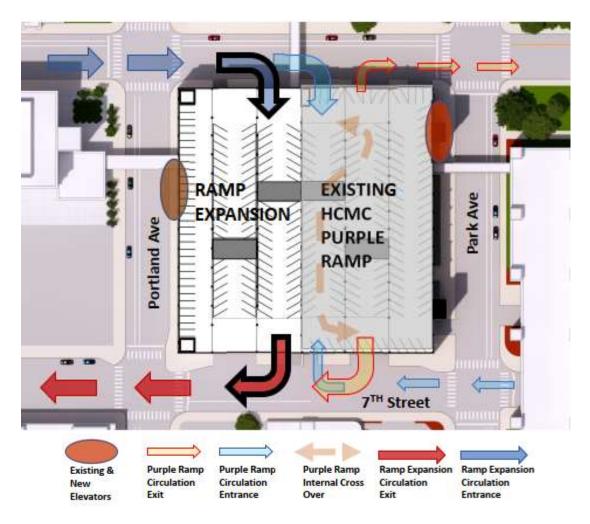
Proposed Ramp & Existing Purple Ramp Site Layout
